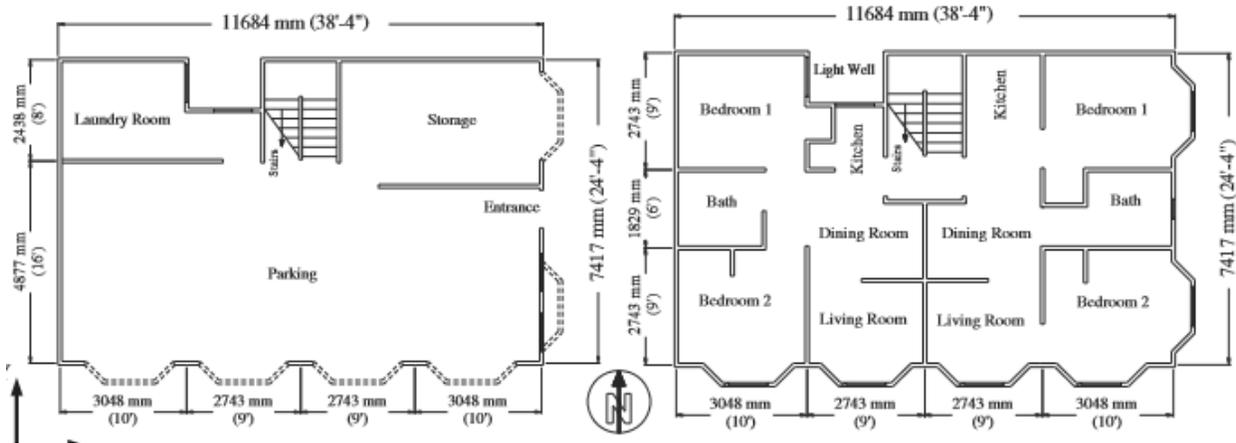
3: First floor (Soft-story) and upper floors plans for the NEES-Soft test building (Bahmani et al., 2014)
